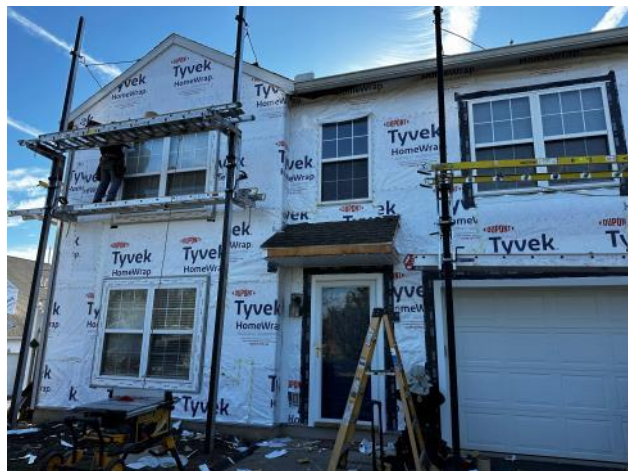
Overview of new Water Resistant Barrier (Tyvek) installed.
